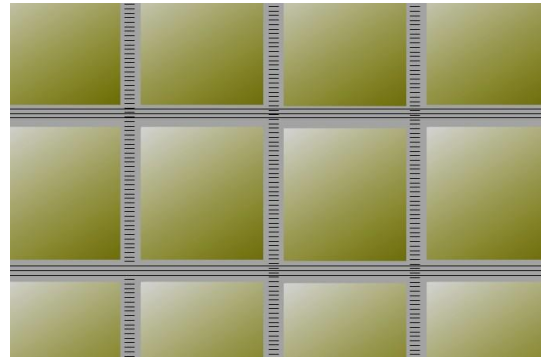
Typical elevation showing glazed windows with wiring mechanisms
